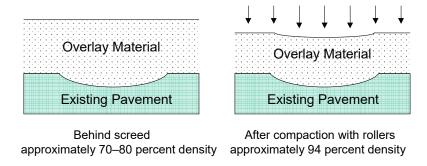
Limitation on achieving a smooth pavement with a single lift of asphalt
